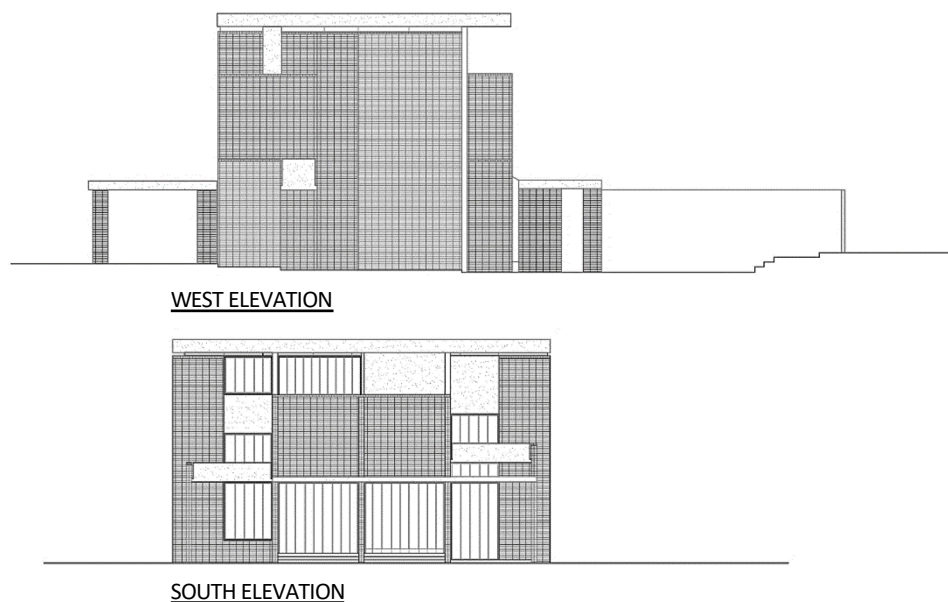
West elevation with minimal openings to reduce heat gain versus south elevation with ample openings for maximising natural ventilation.
